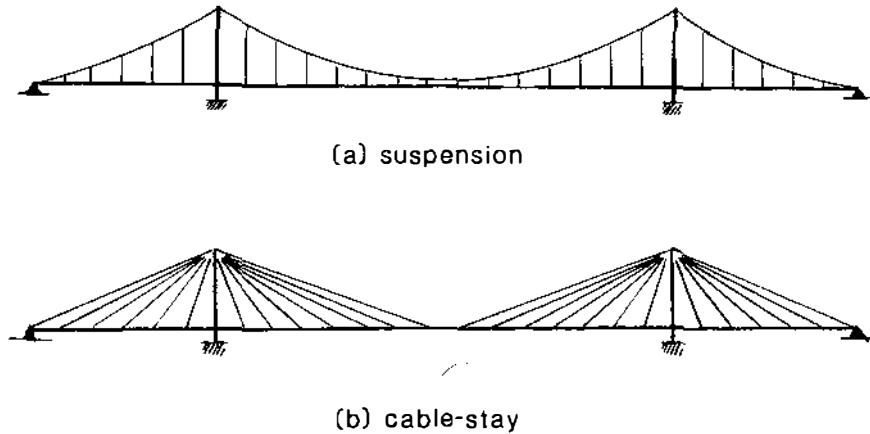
Cable-suspended bridge systems, (a) suspension and (b) cable-stayed.
